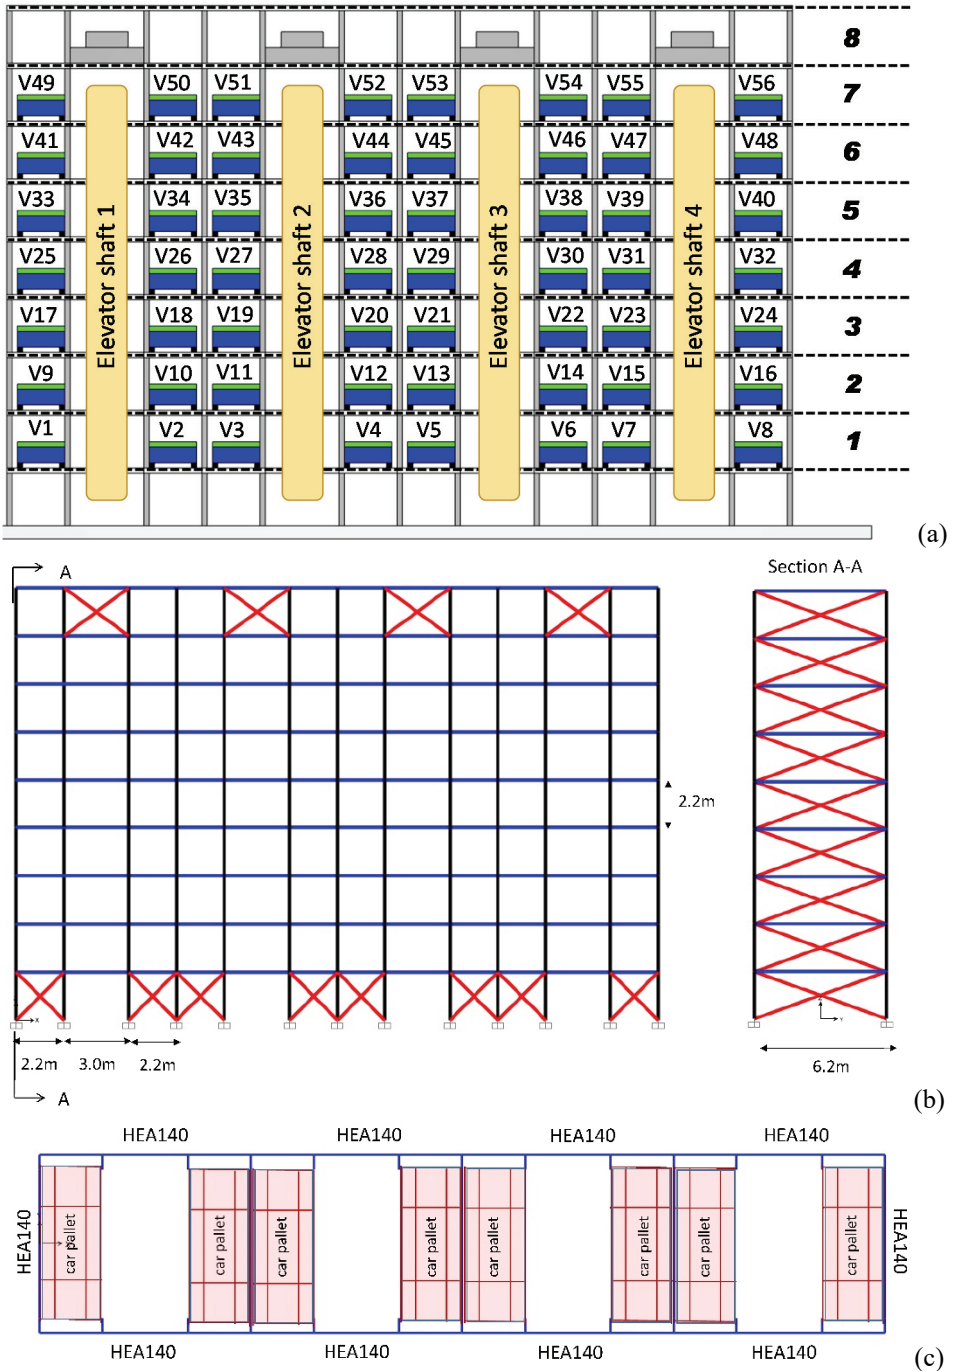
Multi-story parking garage: (a) illustration, structural design (b) elevation view and (c) top view.
